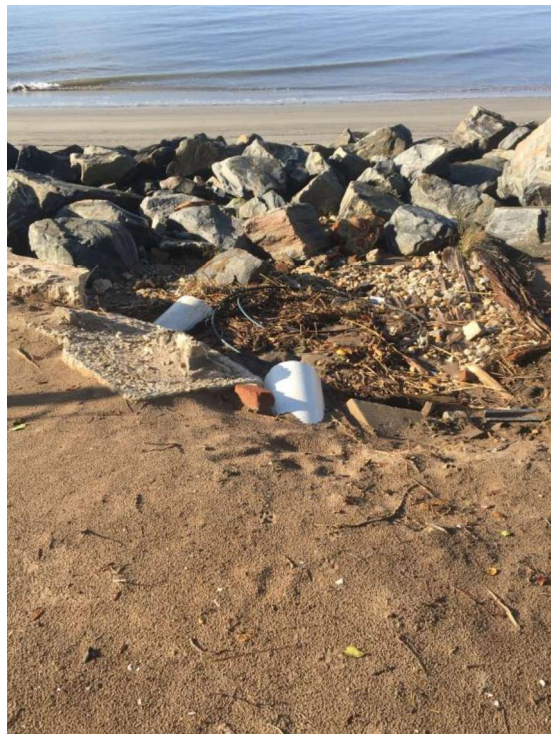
Existing outfall at south end of Georgia St, St. Simons facing south.
